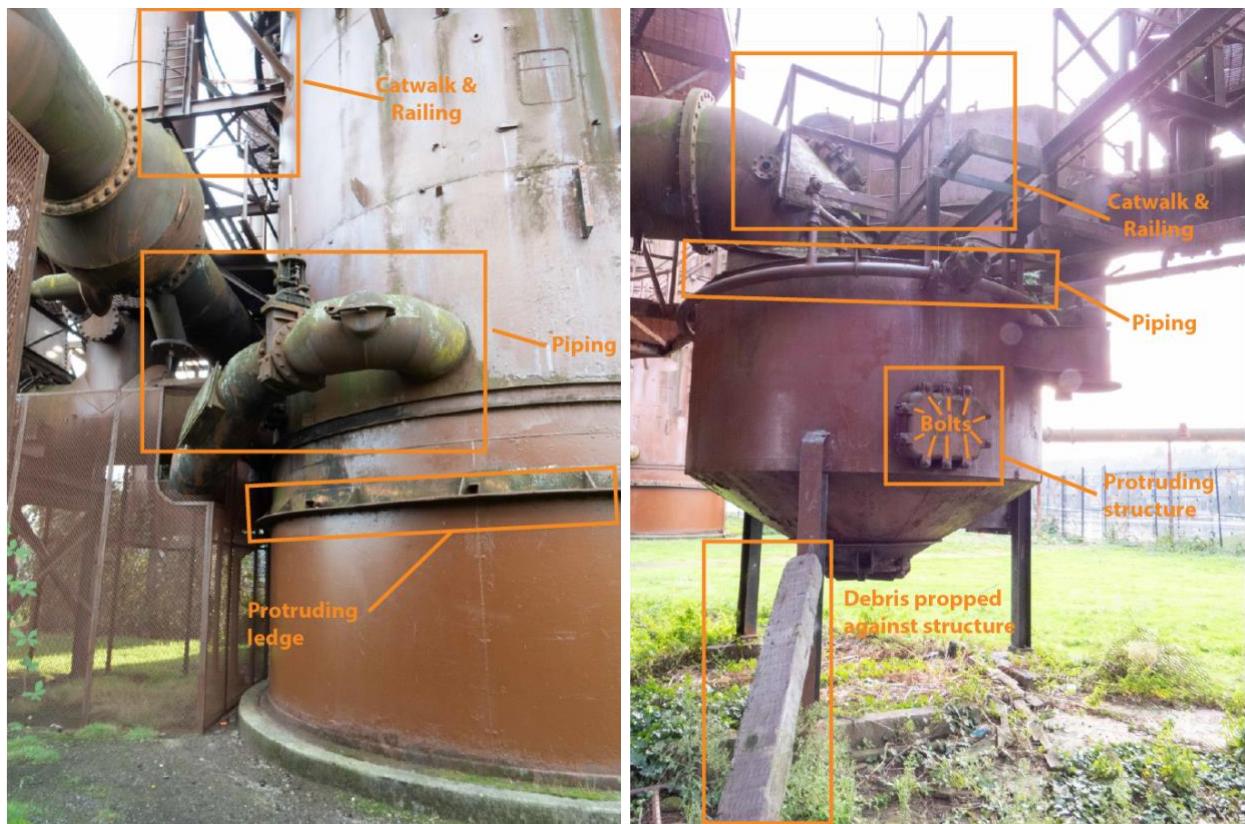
Left)* A protruding ledge on a tower that was approximately 6 feet above a concrete slab that protruded approximately 8 inches from the vertical tower wall. Above the protruding ledge was piping that was less than 11 feet in height from the protruding ledge below and further in height was a catwalk and railing. *Right)* A protruding structure that was approximately 7 to 8 feet above the ground and protruded approximately 7 inches from the wall. This structure had bolts that provided additional areas for finger holds. Above the lower protruding structures there was additional piping and a catwalk and railing within 11 feet. At the time of the inspection, there was debris that was propped against the structure.
